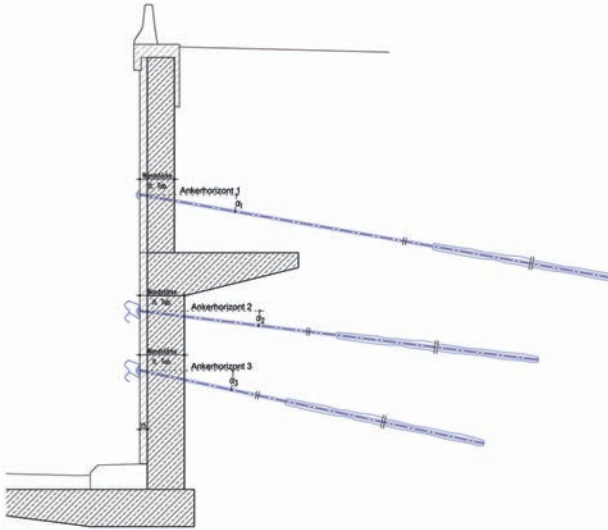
Standard section of retaining wall with a heel, 3 anchor heights
